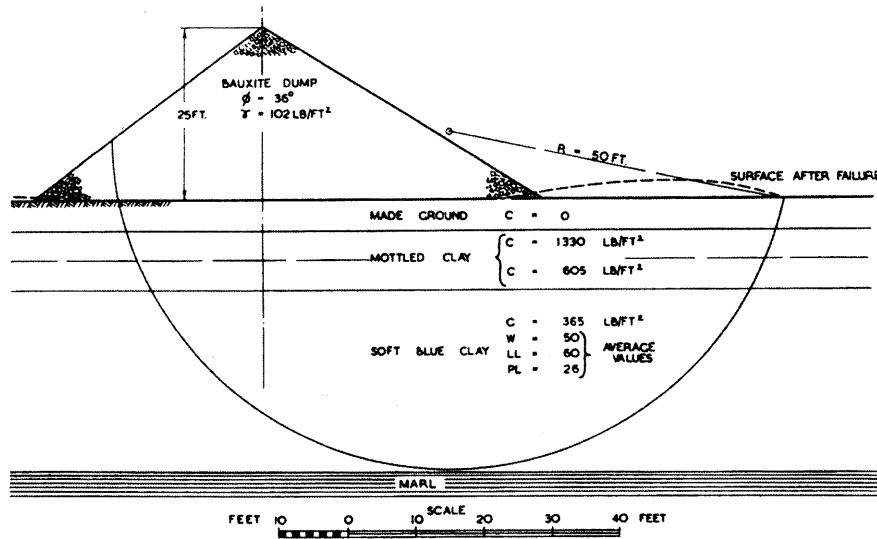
Failure of a bauxite dump at Newport (after Skempton and Golder, 1948).
